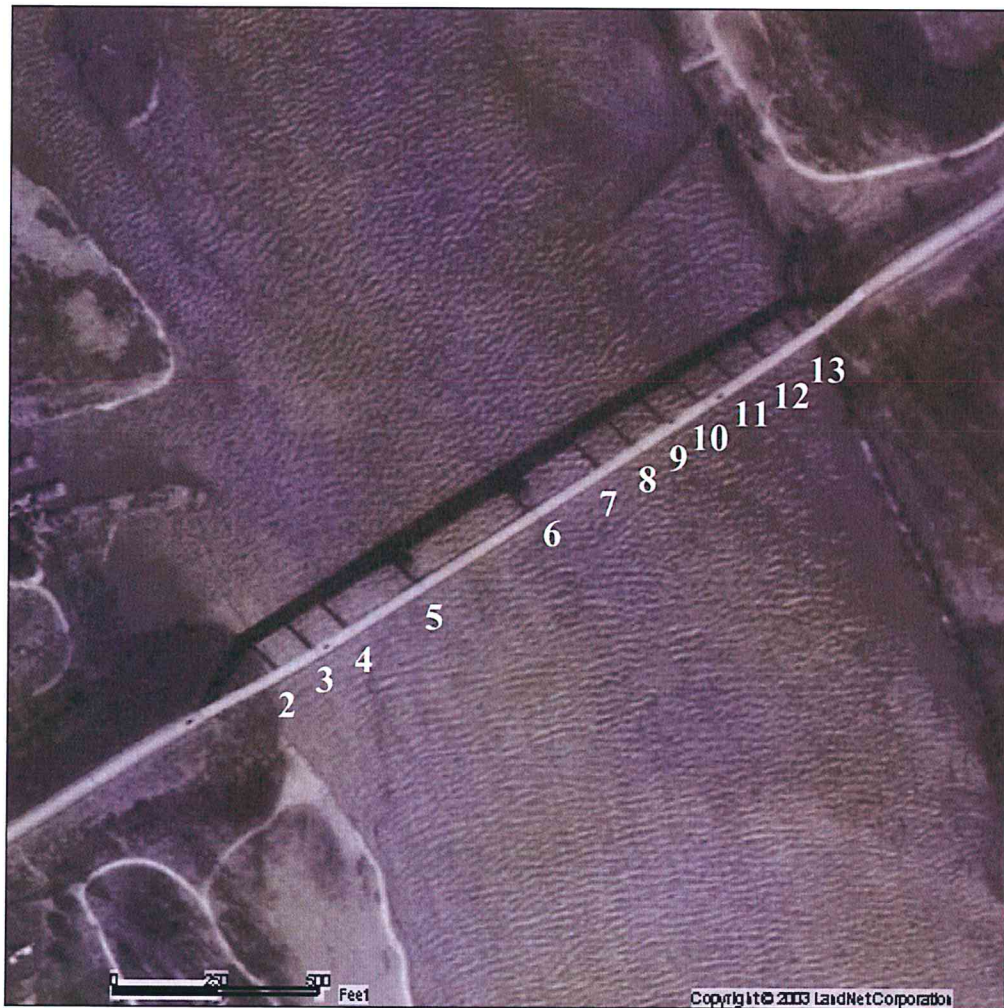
Close-up Aerial Photo of Bridge Crossing (1:6,000)
